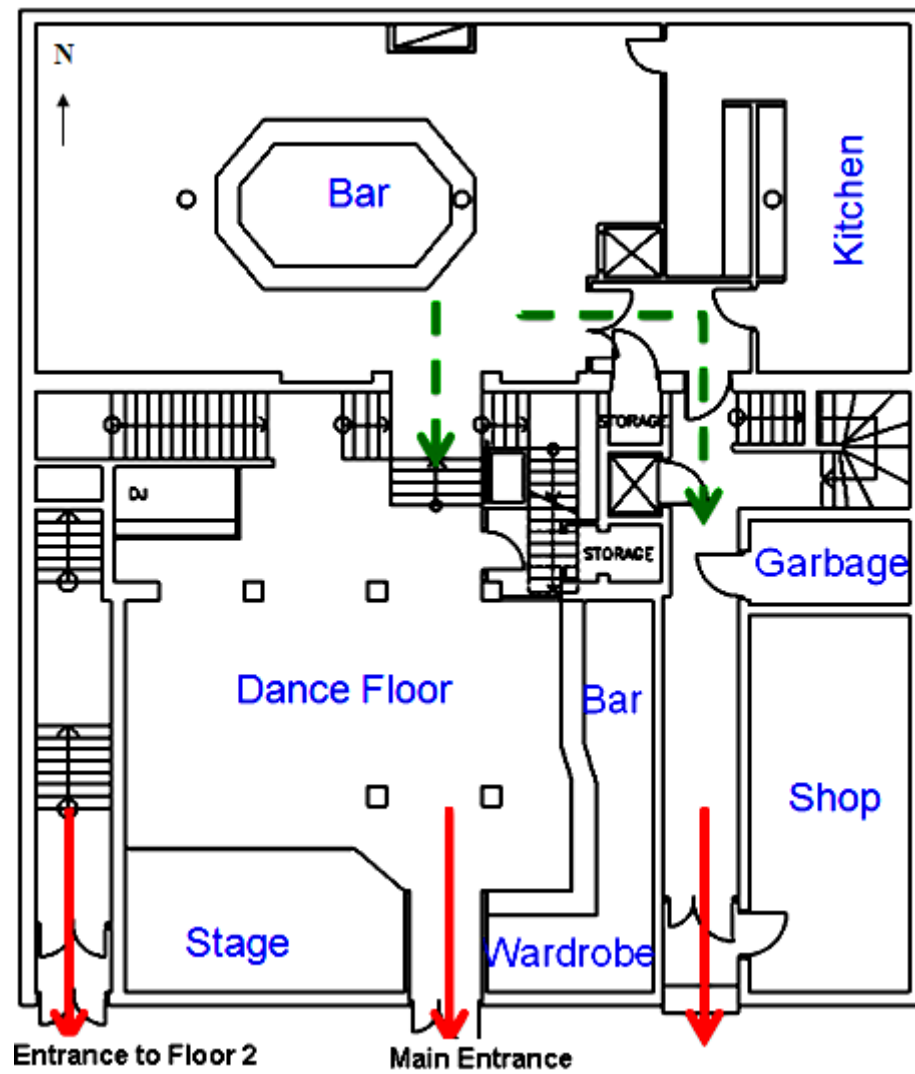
Floor plan of the proposed nightclub – Ground Floor (Floor 1)
